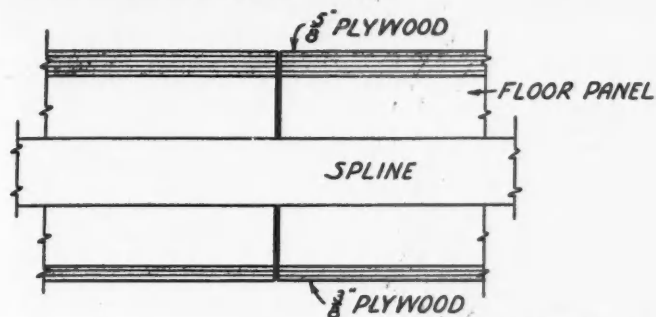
Tie between two floor panels by means of a spline securely nailed to resist horizontal thrust.
